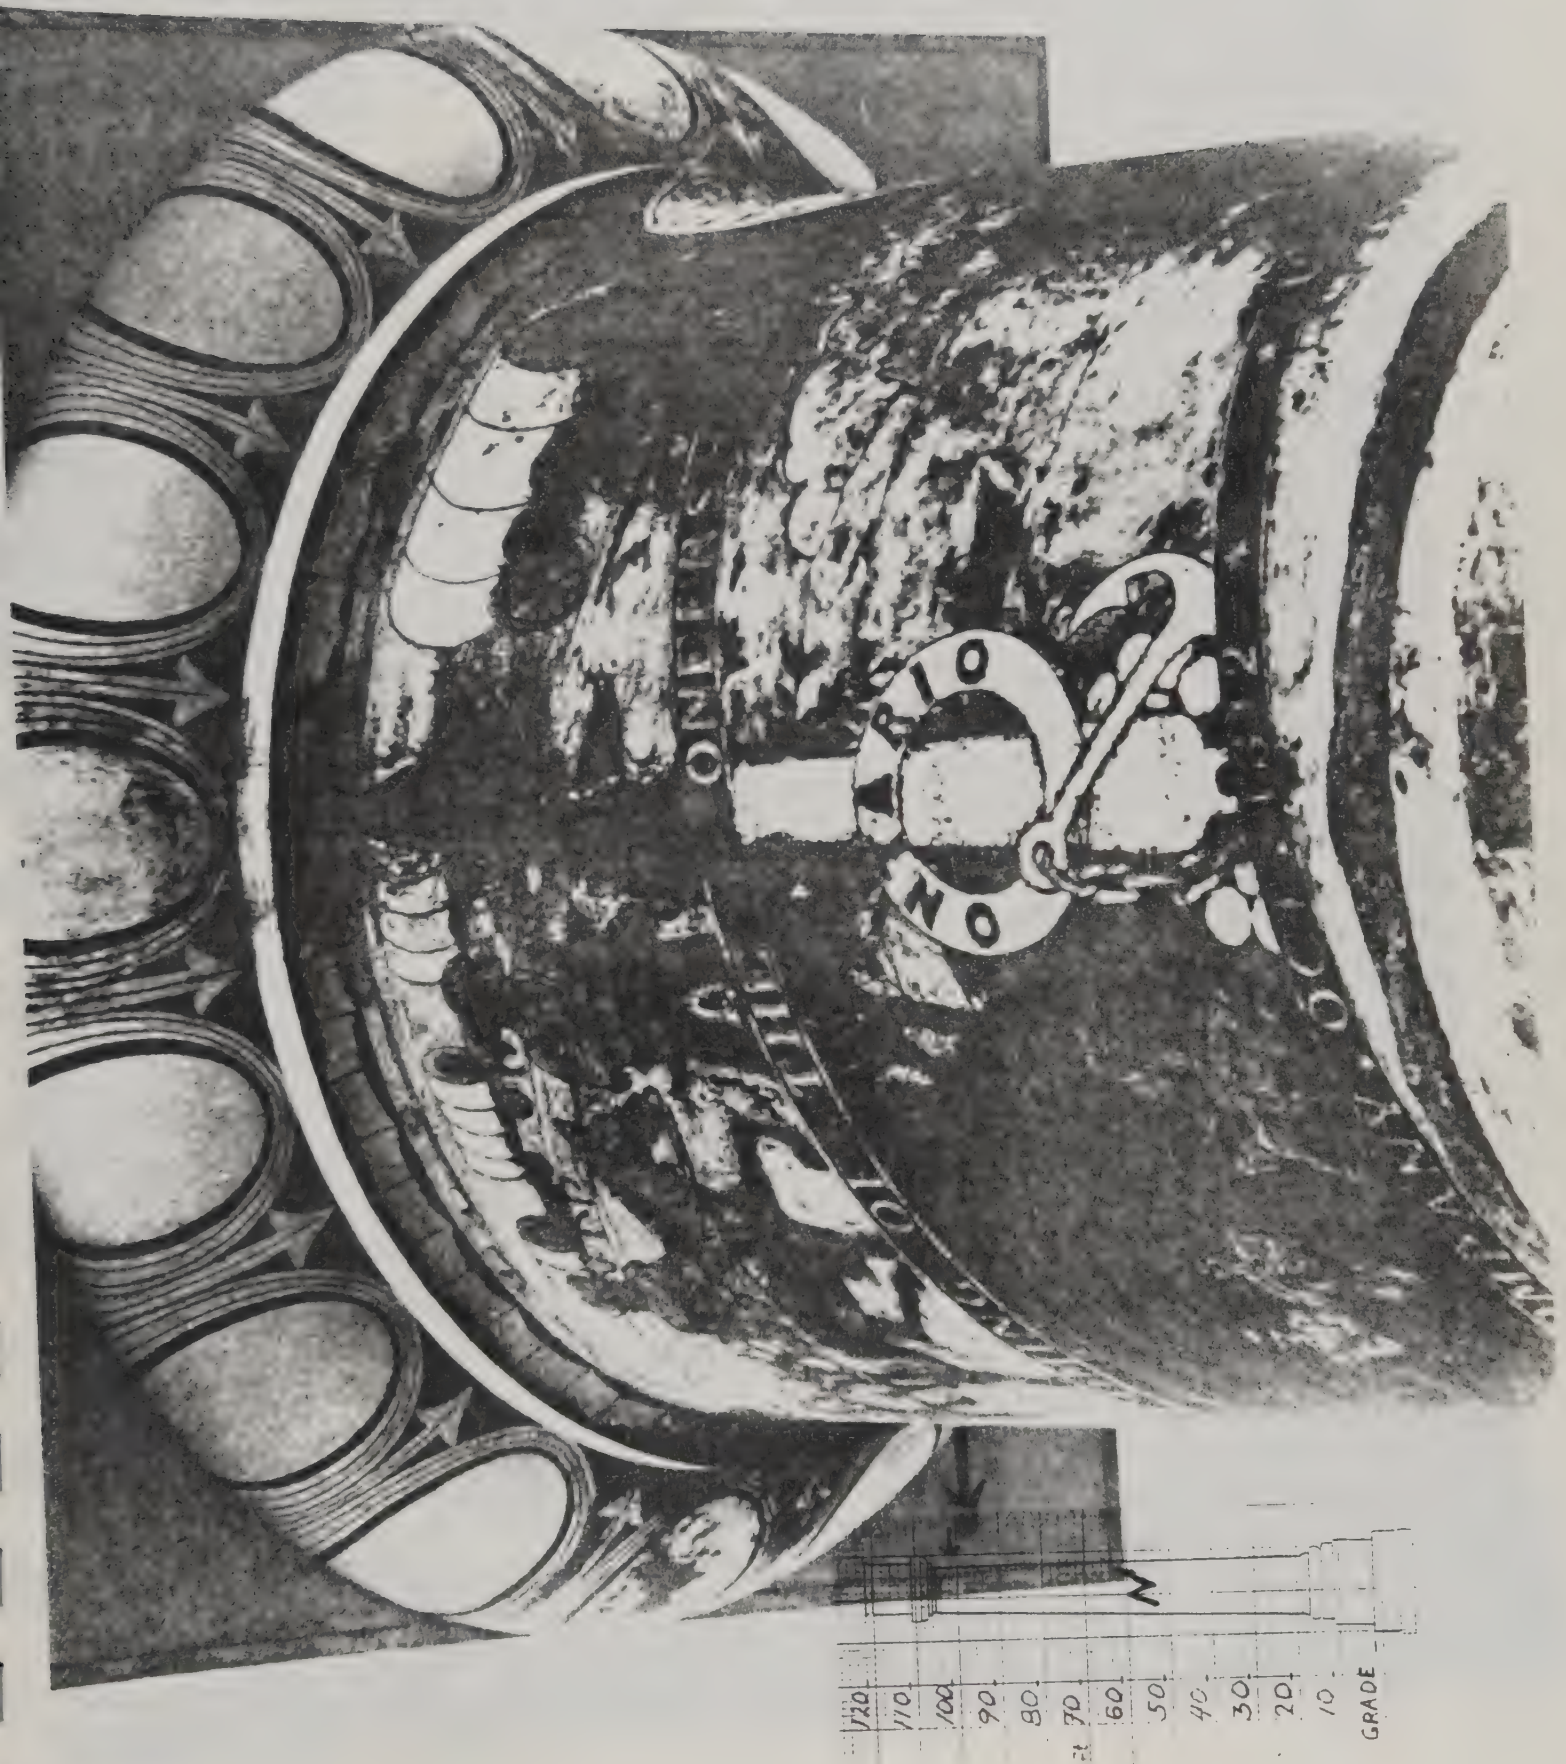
Photo Astoria Column West Face Section-JAN 1989
